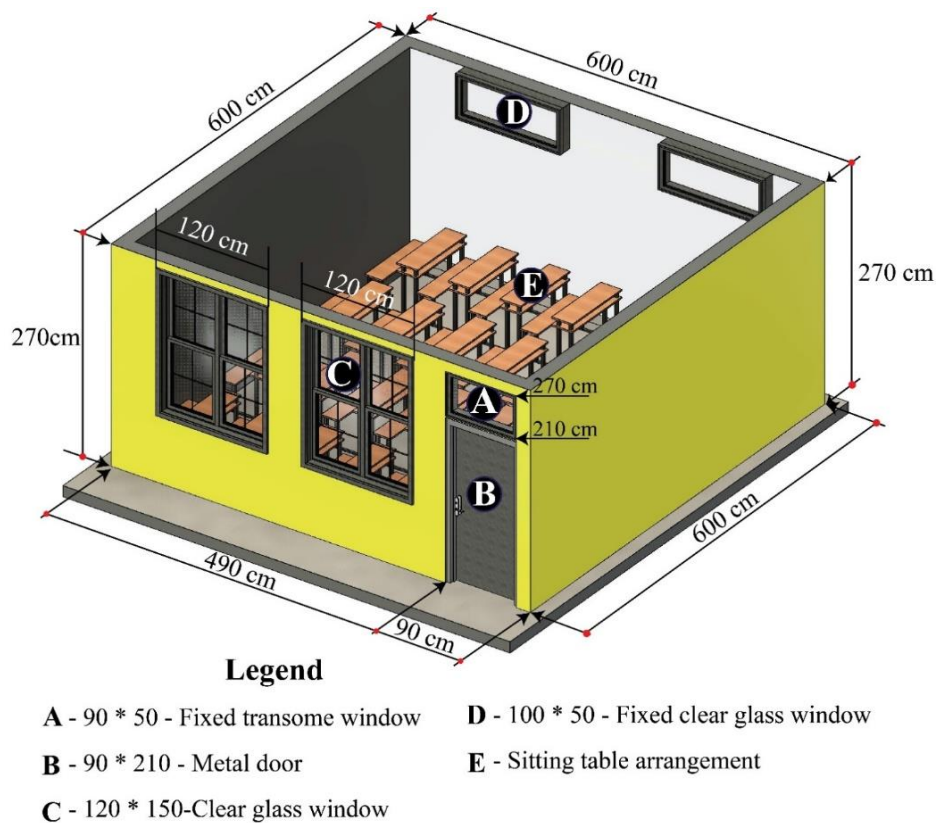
8 Detail of existing classroom buildings (Source: Field measurement by Author, 2024)
